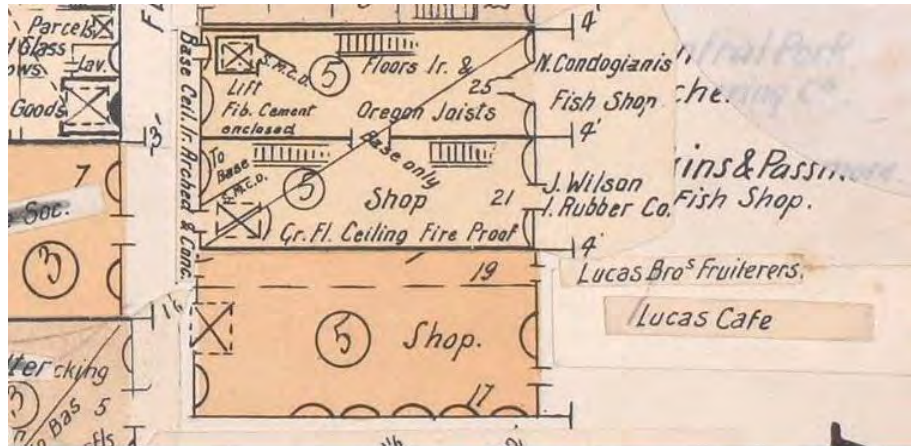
Section from 1910 City of Melbourne Detail Fire Survey Plan by Mahlstedt shows the subject building with an enclosed fibro-cement lift with single metal clad doors, iron floors and Oregon joists, as well as an internal opening connection no 25 with no 21-23 next door. (Source: Mahlsted Map, no 15, 1910)
